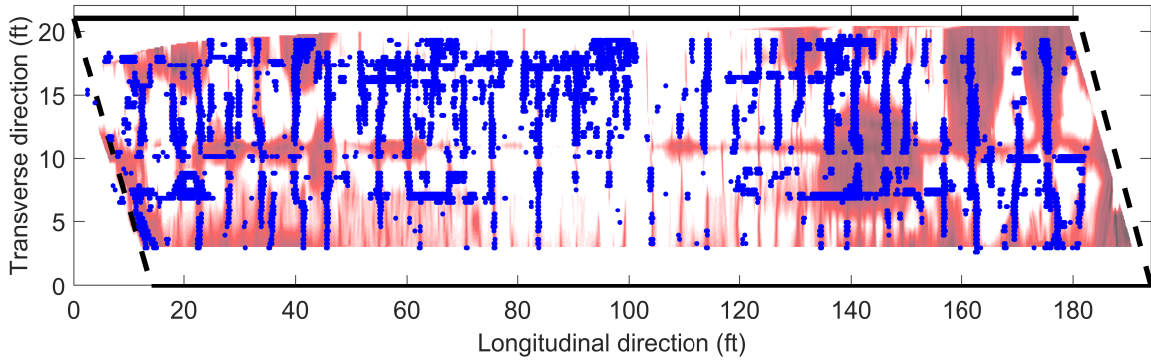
VEI map and crack locations for bridge deck S077 05693R.
